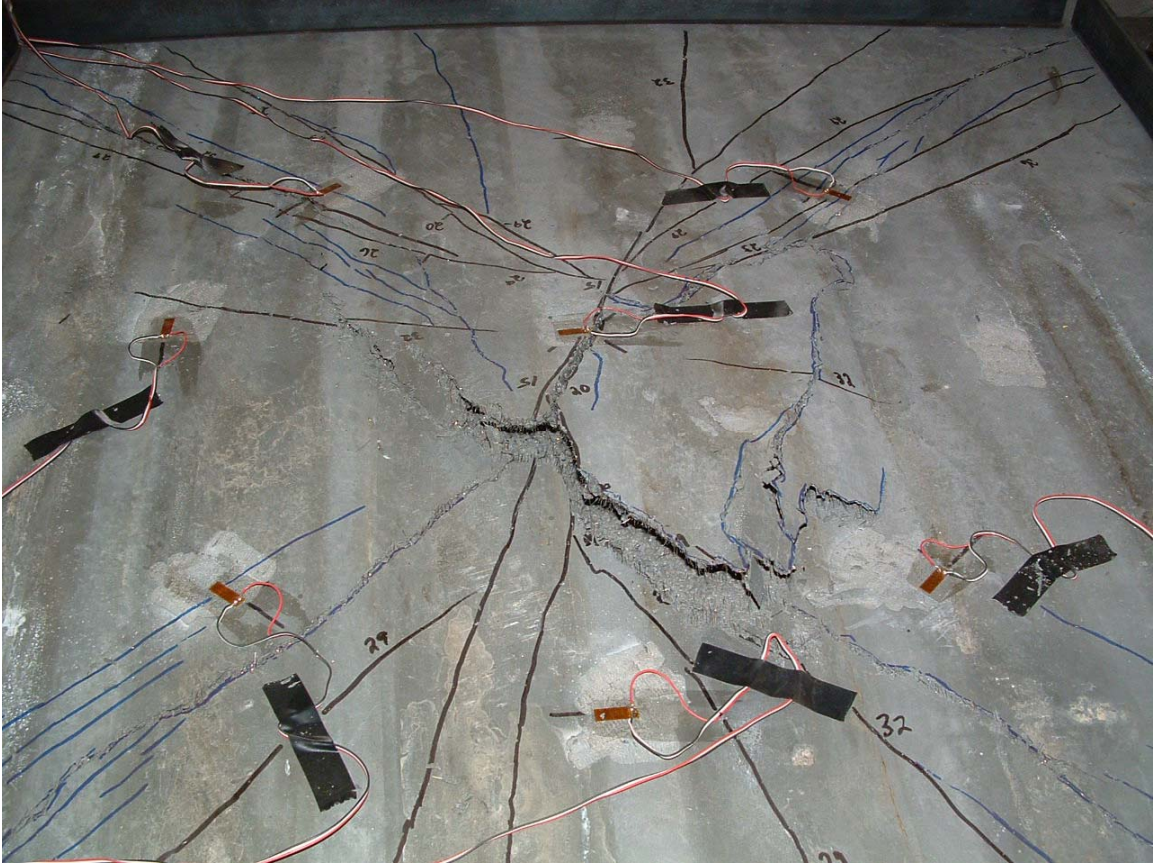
Failure Surface (3.0 in. slab – 1.0 in. plate)
